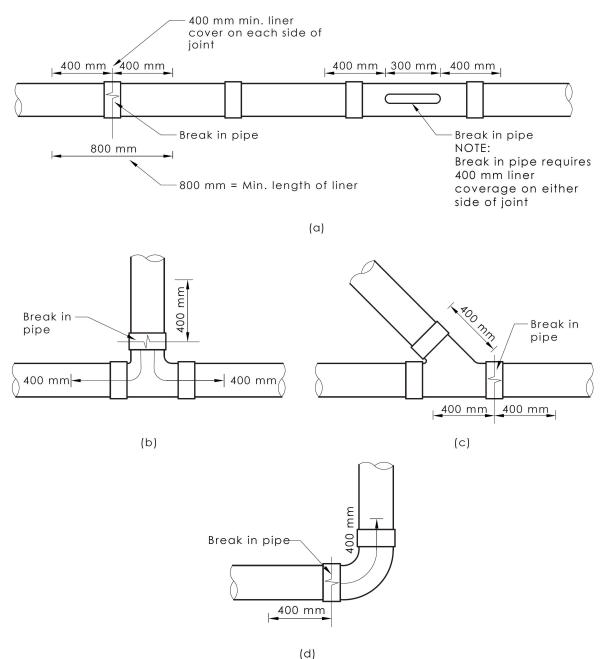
Minimum Length of Liner for a Damaged Pipe or Fitting
